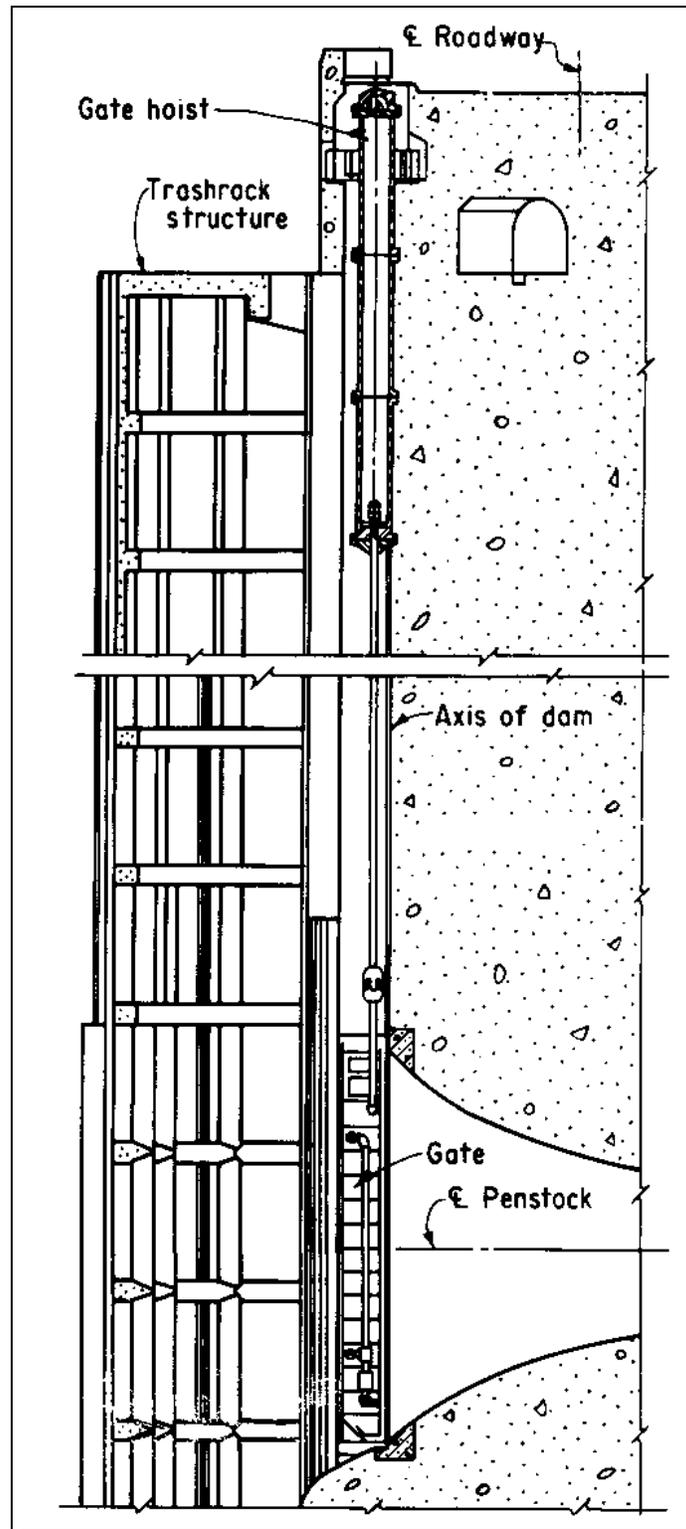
Typical fixed wheel gate installation at upstream face of dam (USBR)
